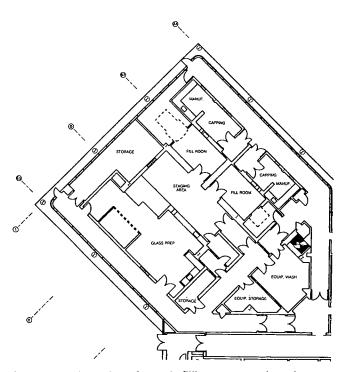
Floor plan of aseptic filling rooms and staging room with adjacent support areas (courtesy, Glaxo).
